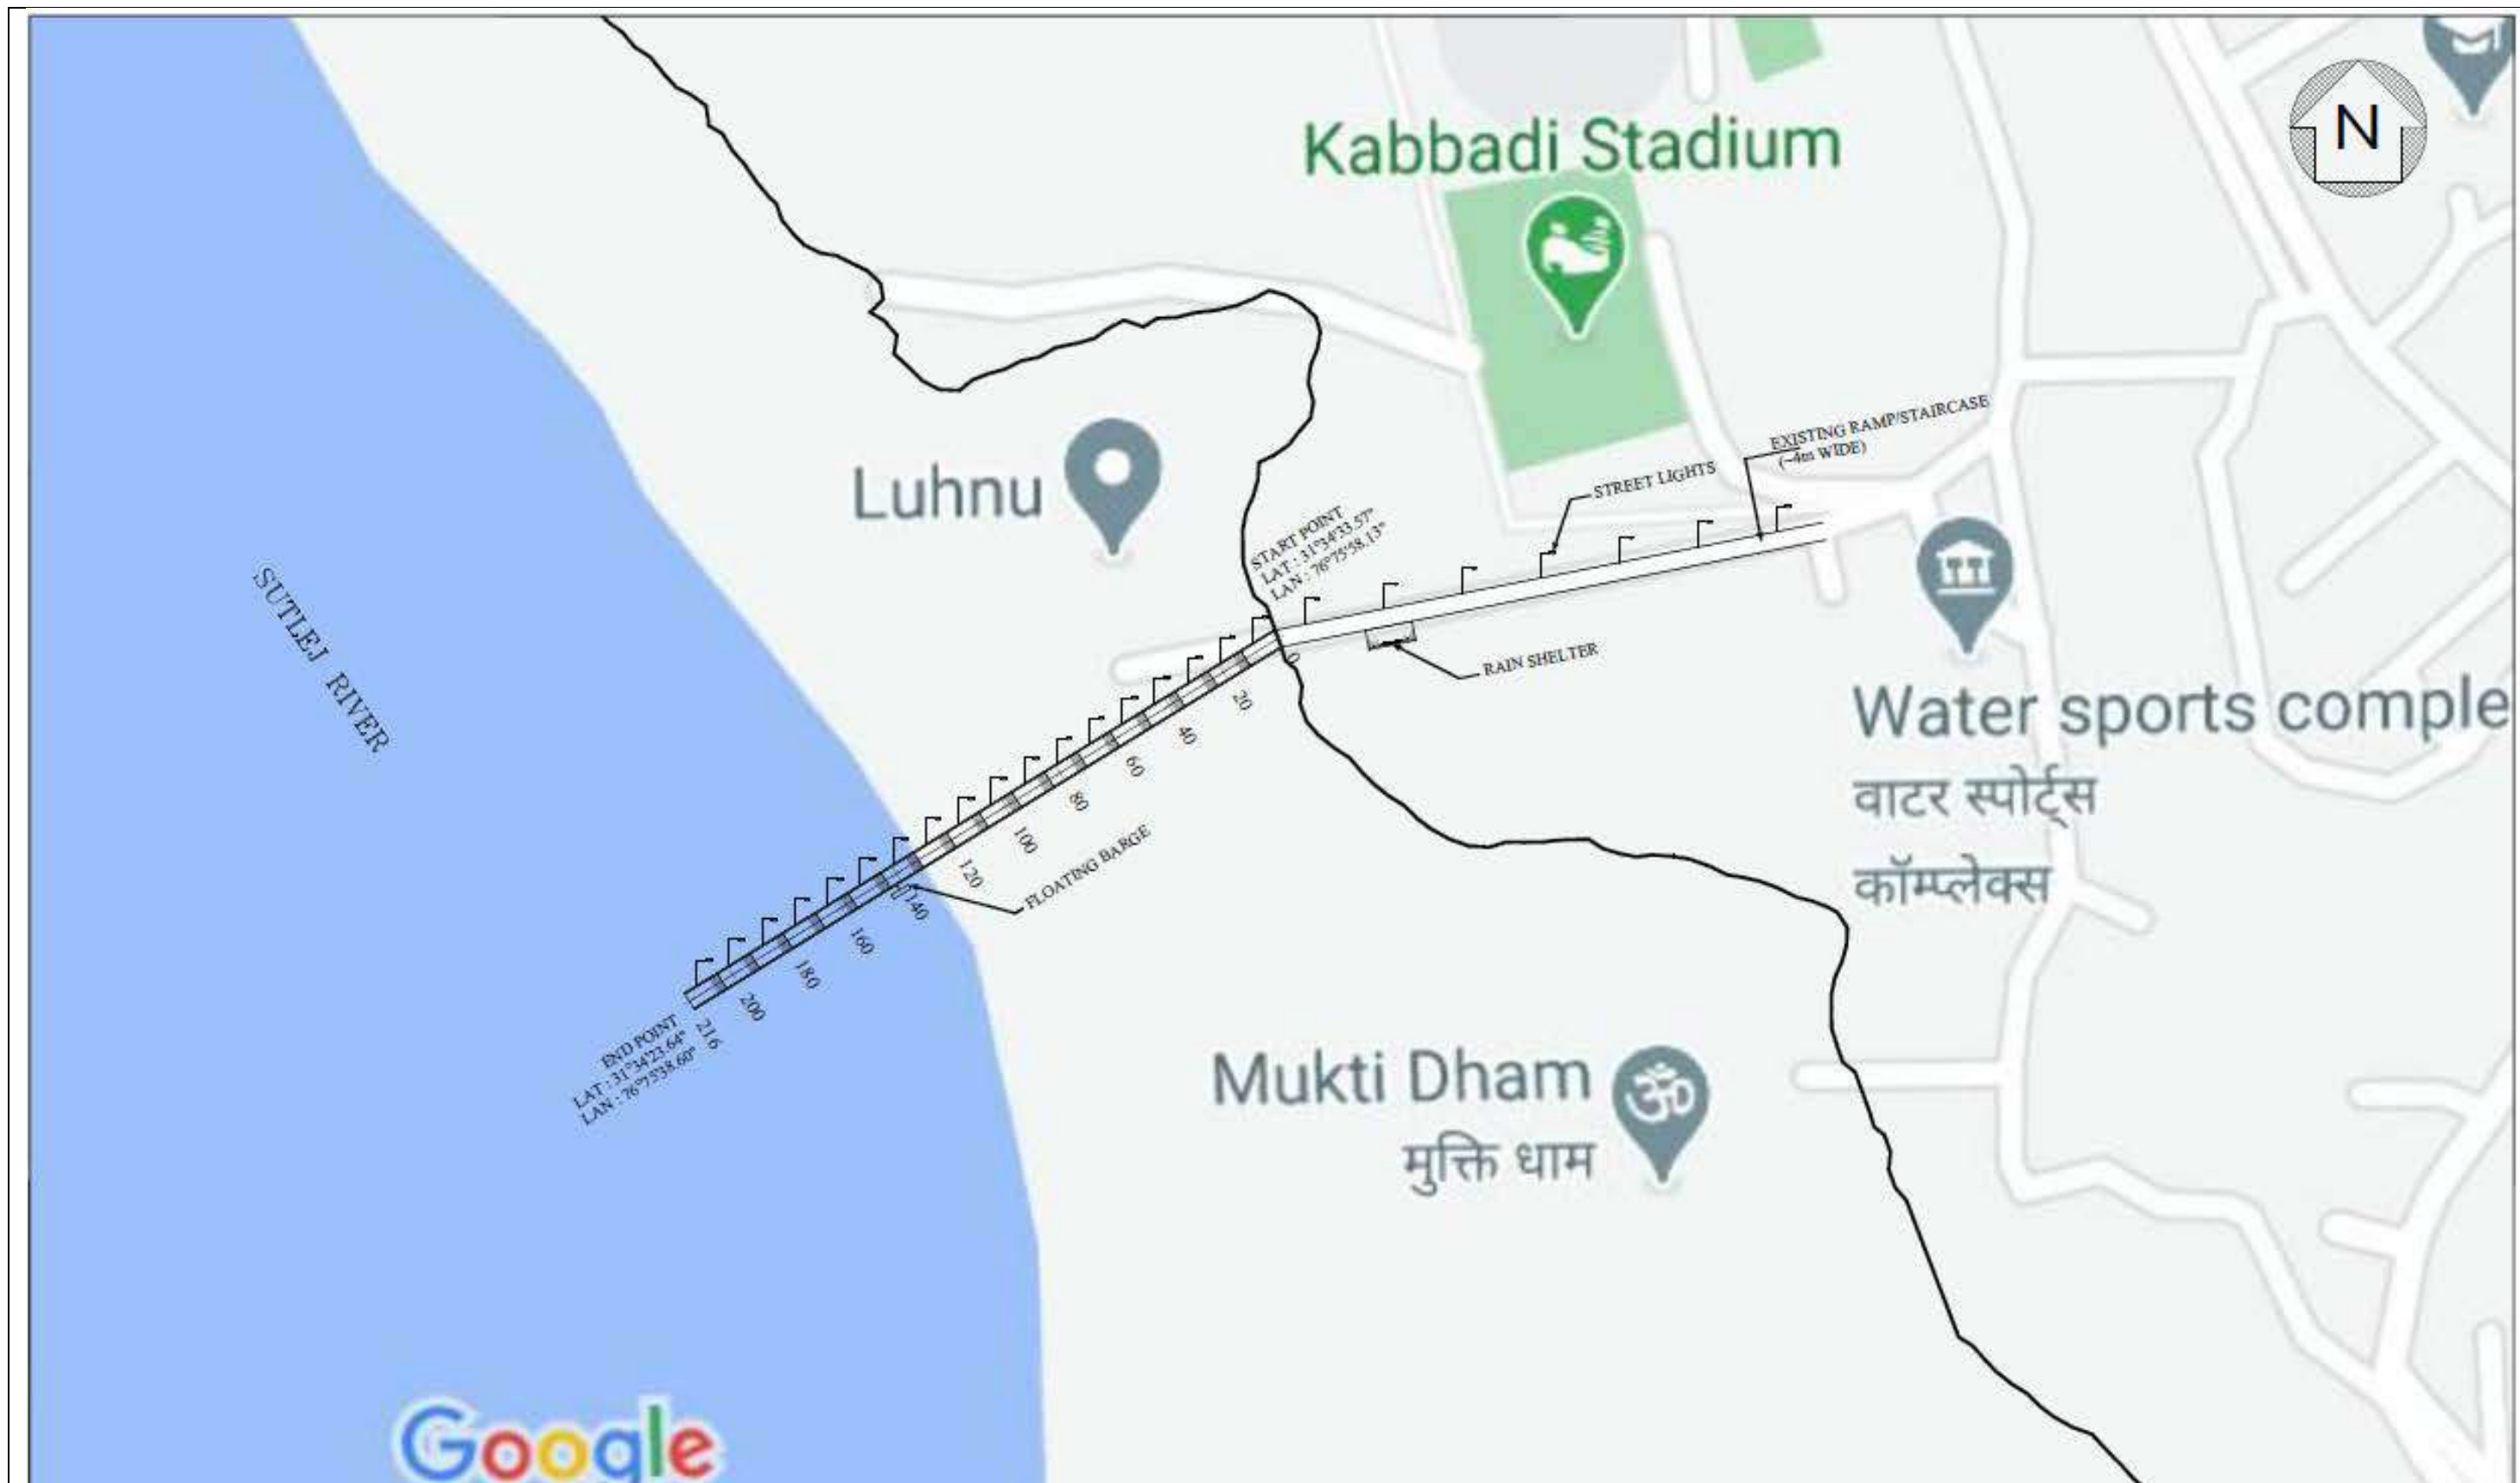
Plan of Proposed Jetty Facility near Luhnu Stadium Bilaspur
